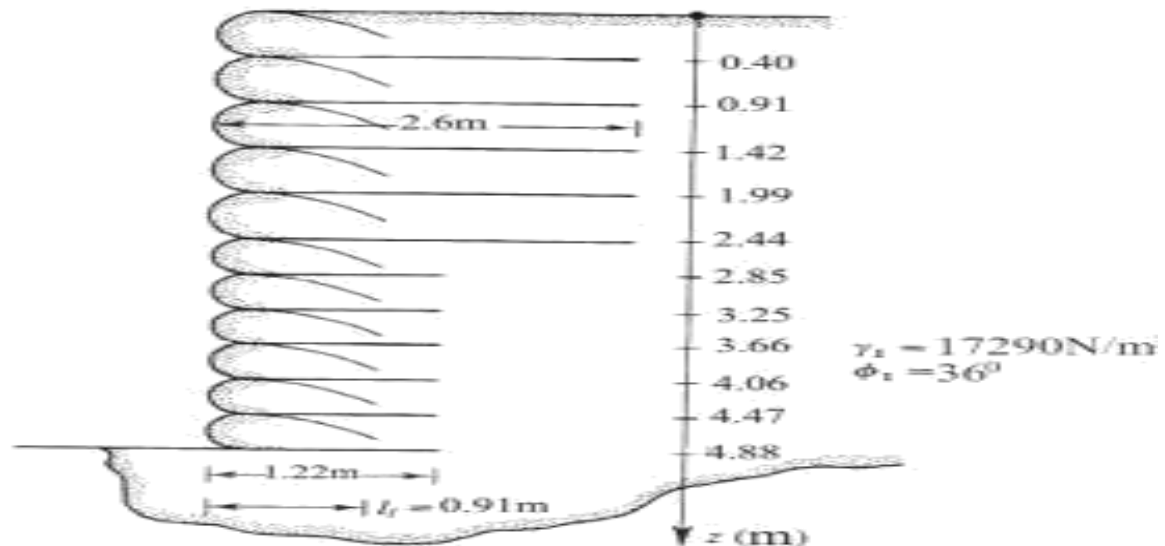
Design Presentation of a Geotextile-Reinforced Revetment (Retaining Wall) 4.88m High.
